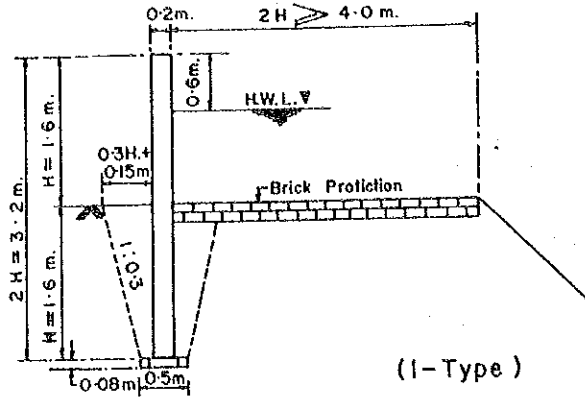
(3) LONGITUDINAL SECTION OF FLOOD WALL/EMBANKMENT (NE-2):
